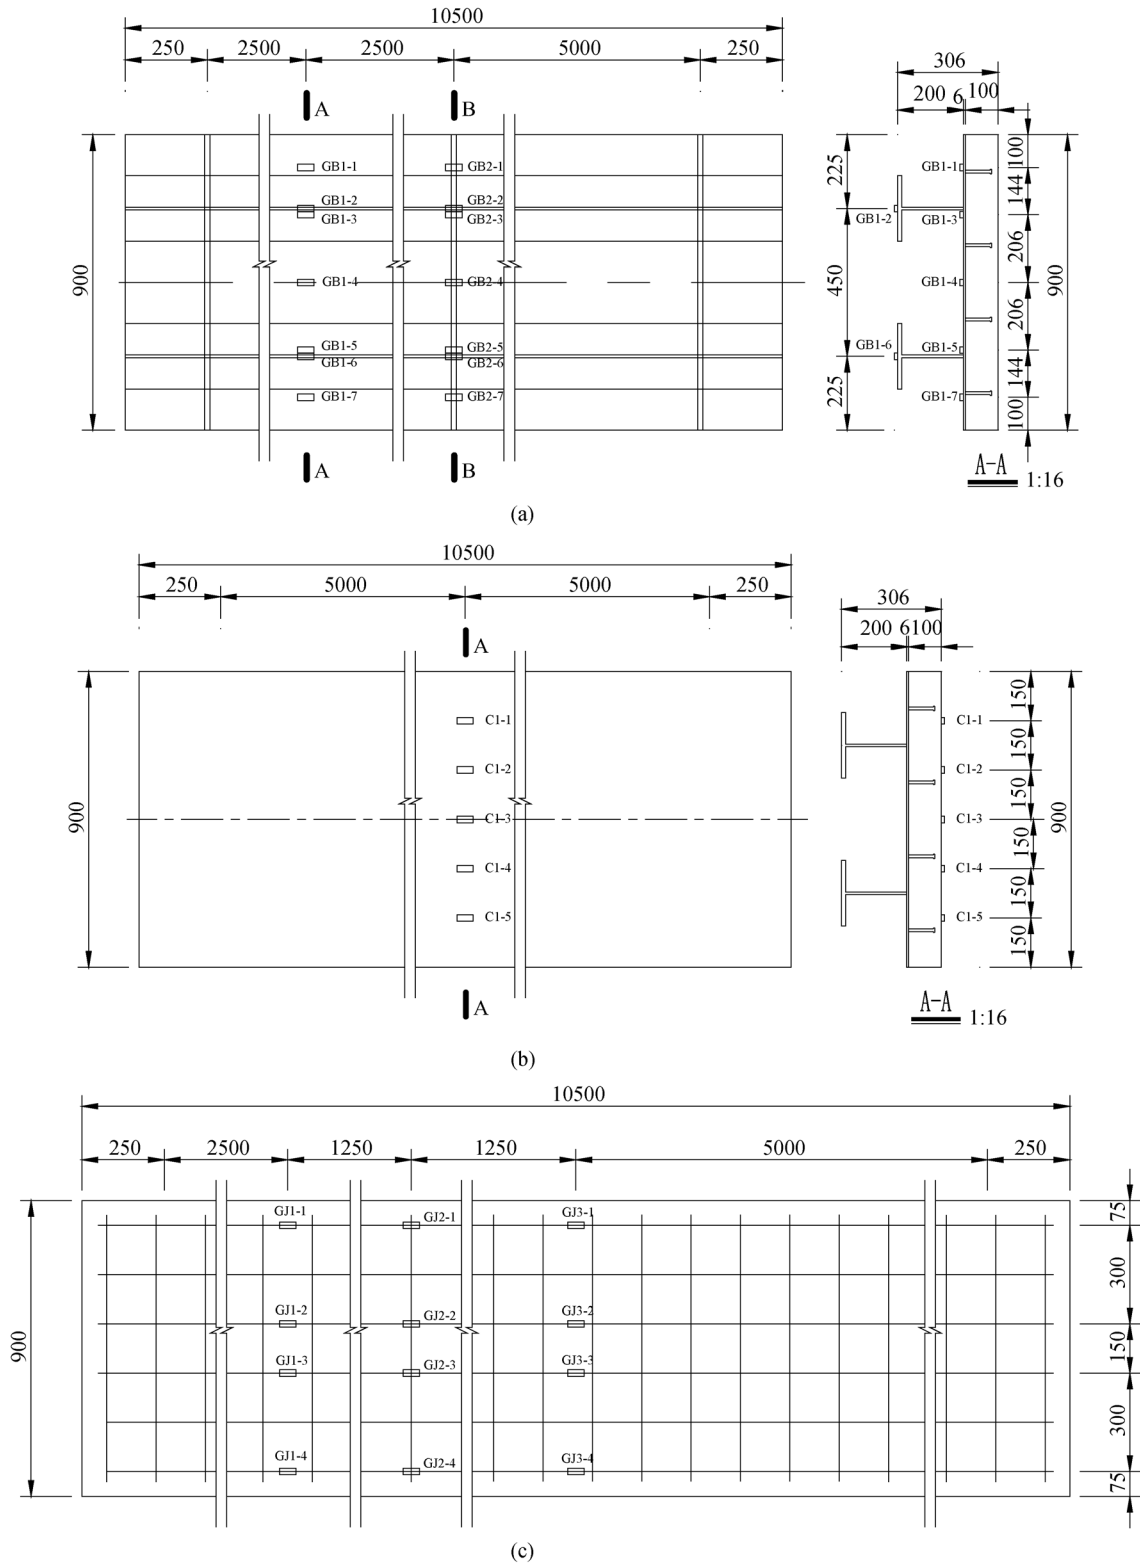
Layout of strain gauges of the specimen S-1 and S-2. (a) Layout of longitudinal strain gauges of the steel plate; (b) layout of strain gauges in the concrete; (c) layout of strain gauges of steel bars
